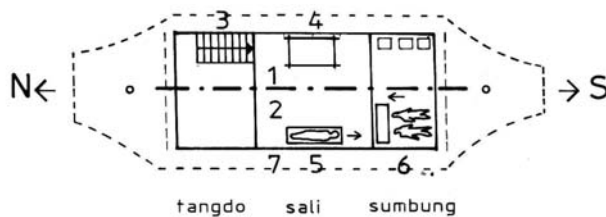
Ground plan of a Tongkonan. (Source: Kis-Jovak, et al., 1988)
